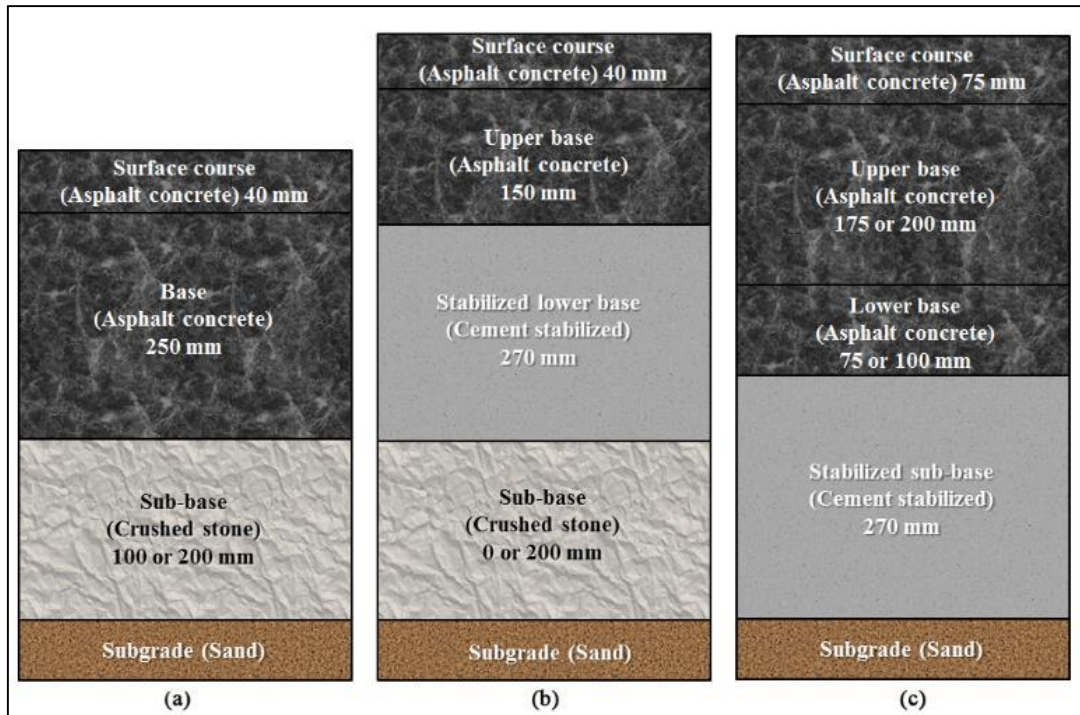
Cross sections for the assessed asphalt pavement structures: (a) asphalt concrete (flexible) design; (b) flexible-composite design; (c) perpetual pavement.
